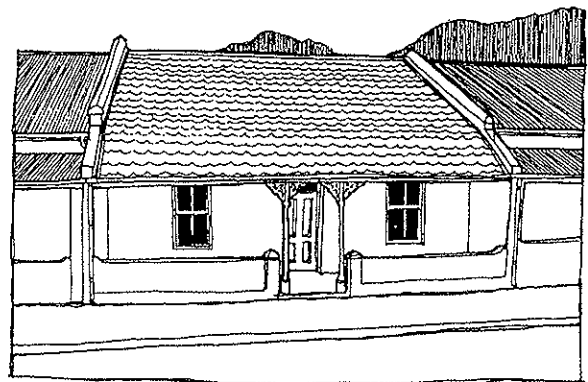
Pressed metal roof tiles have a disturbing texture and, if carried over the verandah, change the shape of the roof.
